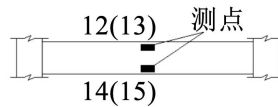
Layout of stress measurement points for mid-span cross beam of cable-stayed frame
